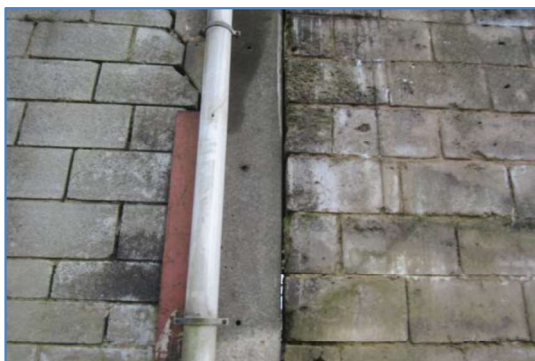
Connection of building 1 and 2 with crevices in the breeze-block walls.
